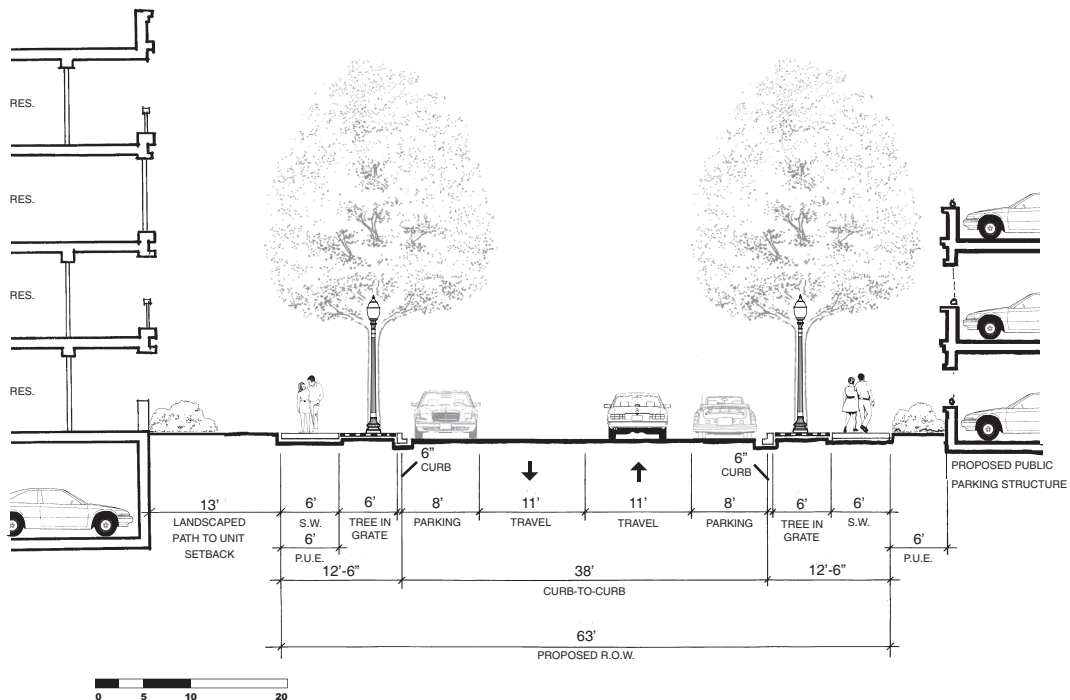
C.33: Cross Section of Civic Center Drive at Residential and Public Parking Garage
